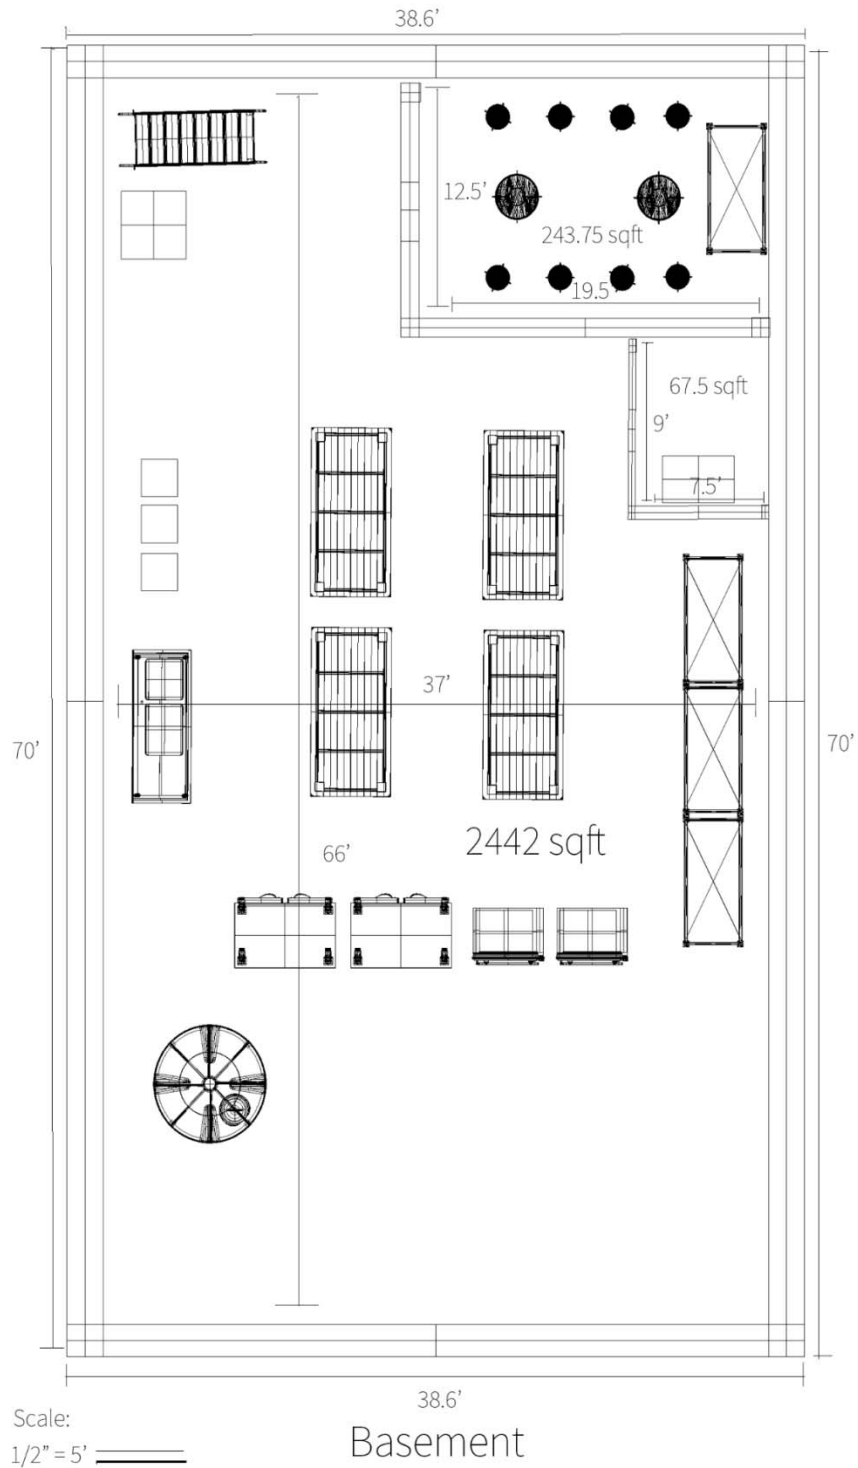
New floor plan for the basement, serving mostly as storage, some of which refrigerated but also including a break room and an office.
